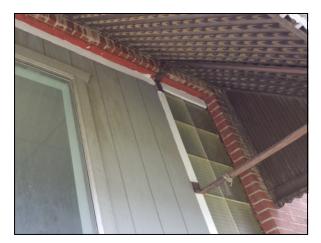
A&B constructed a temporary water barrier where the gutter had been, draining toward the downspout.
